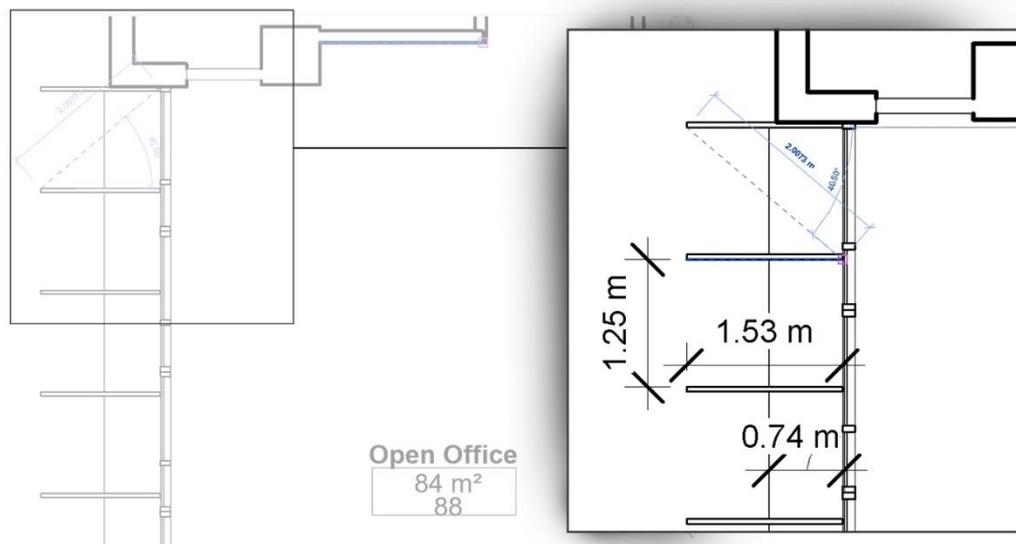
Detail Plan Drawing of Vertical Shading Devices (Author, 2021)
